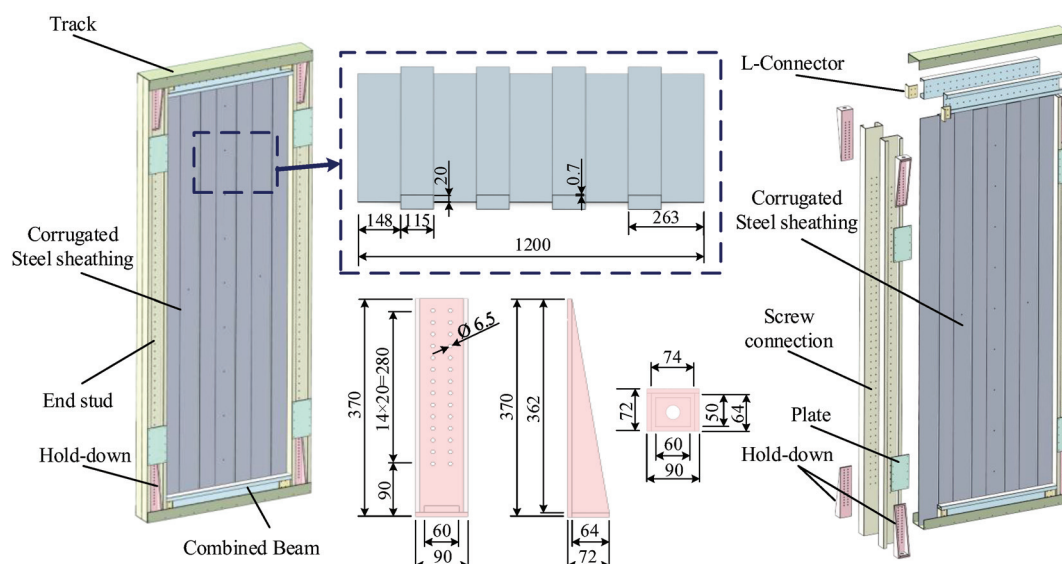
Schematic diagram of CCS-CFS shear wall (unit: mm).
